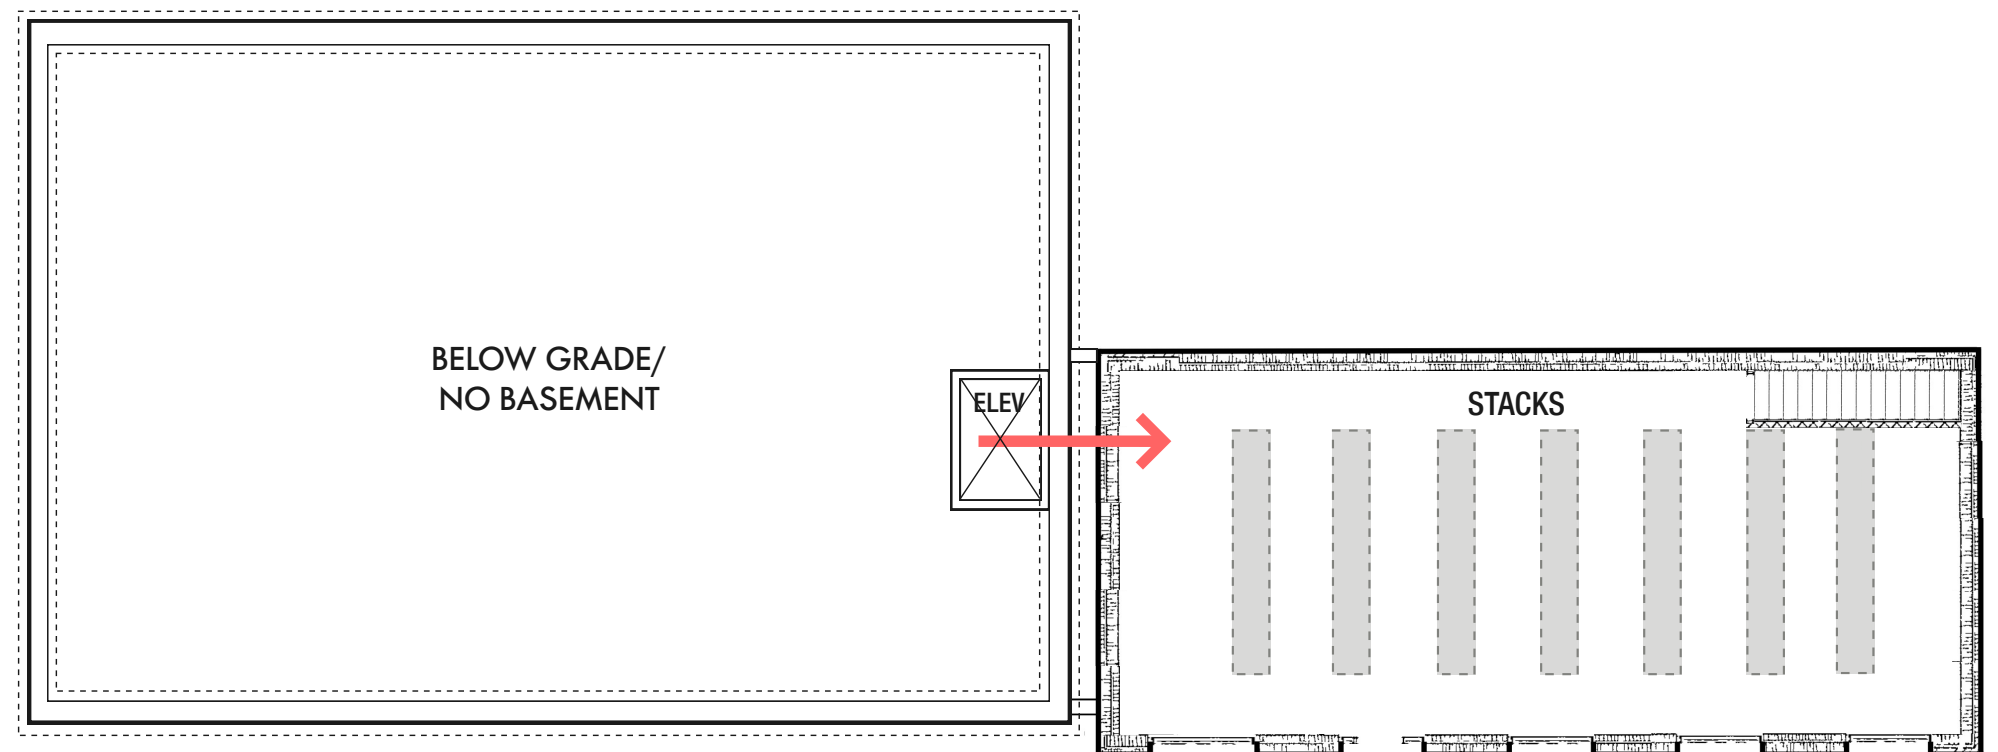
PINE BLUFFS BRANCH , SECOND FLOOR PLAN, OVERLAY BY JLG ARCHITECT
